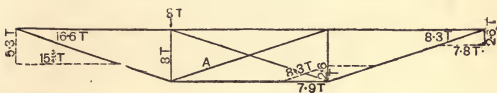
Diagram of Compound Truss with Load over one Strut.
